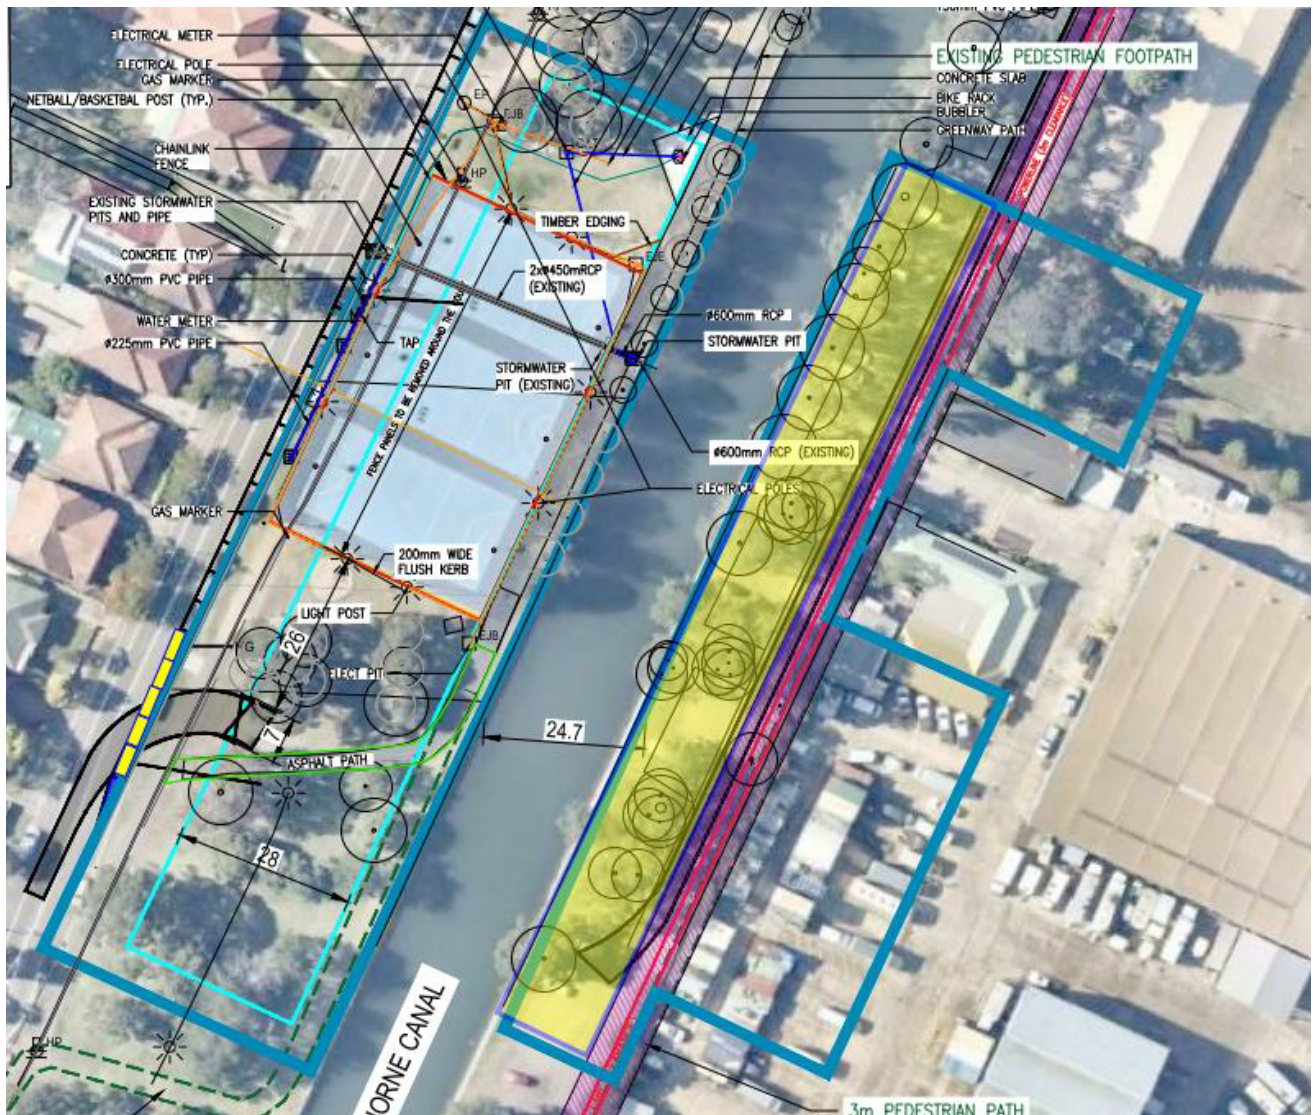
Canal Road and Hawthorne Parade Surface Grouting area - On-street Parking Changes (in Yellow)
